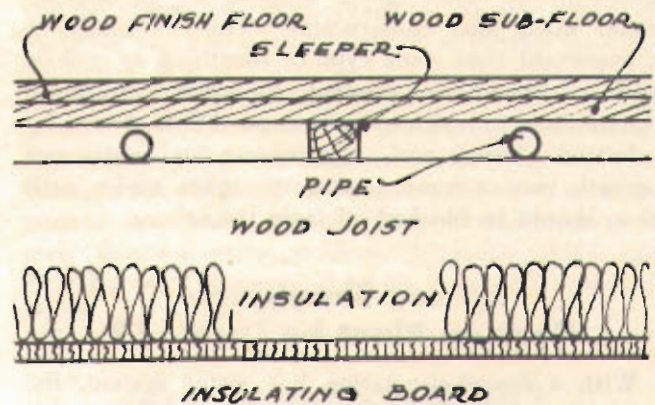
Furred Wood Floor—Pipes Resting on Joists.
